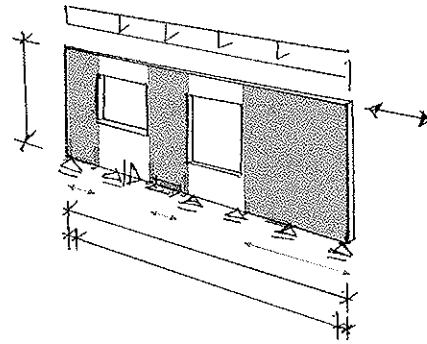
Example of massive wood wall with openings and principle of design with only full wall segments.
